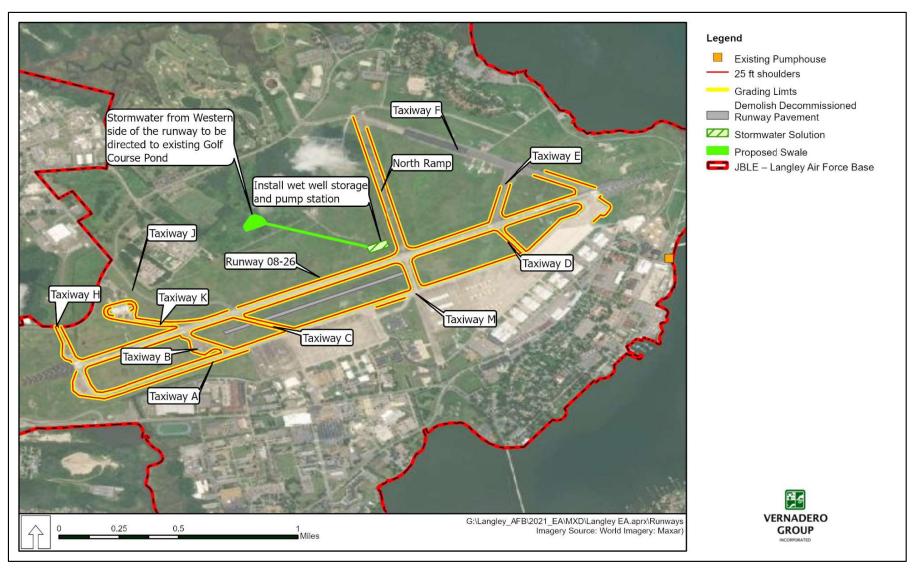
Proposed Action of Runway 08-26 taxiways and shoulders repair on Joint Base Langley Eustis – Langley Air Force Base
